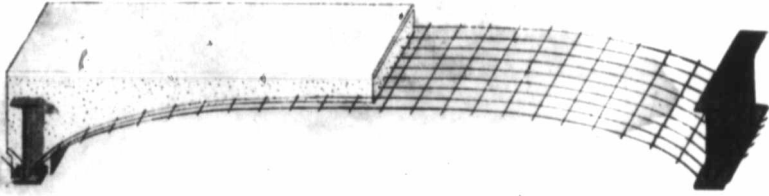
shows a light construction with spans as wide as 15 feet centre to centre.
